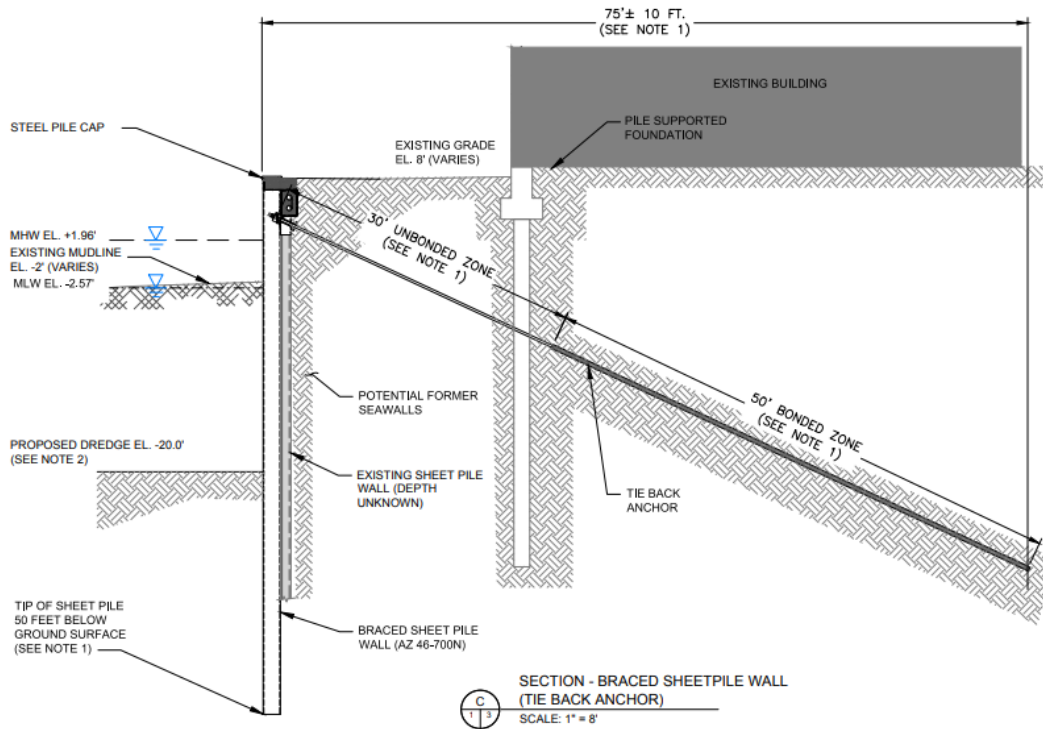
Typical Cross Section of Existing and New Sheet Pile Walls with Tie Back Anchors
